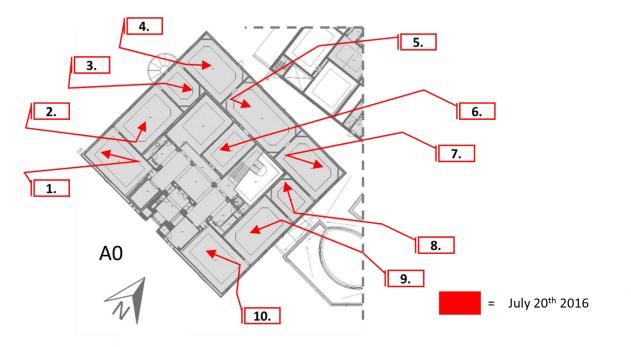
IRT bottom surface internal plenum structures, measurement locations A0, floor plan under layer by Cahen (2003).
